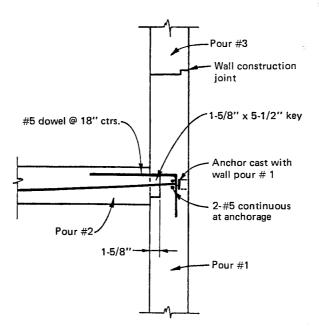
Detail of Post-Tensioned Anchorage Zone in Slab which is cast Monolithically with Wall
